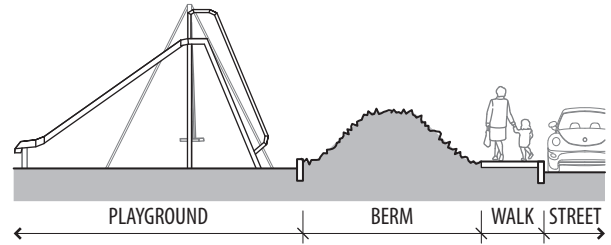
In this section, a berm is used to separate a playground from a street.
